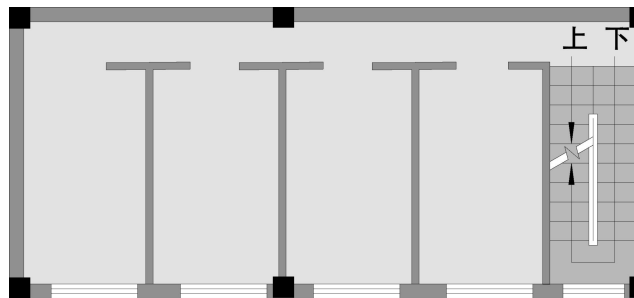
32Existing Floor Plan of the Building Unit 1:50
